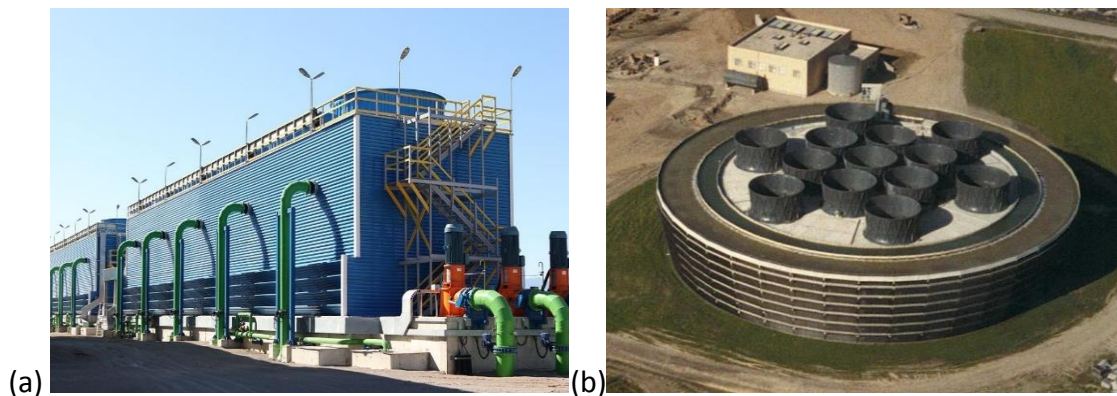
Mechanical-draft Tower designs: (a) rectangular structure tower (b) circular structure tower [27] [28].
